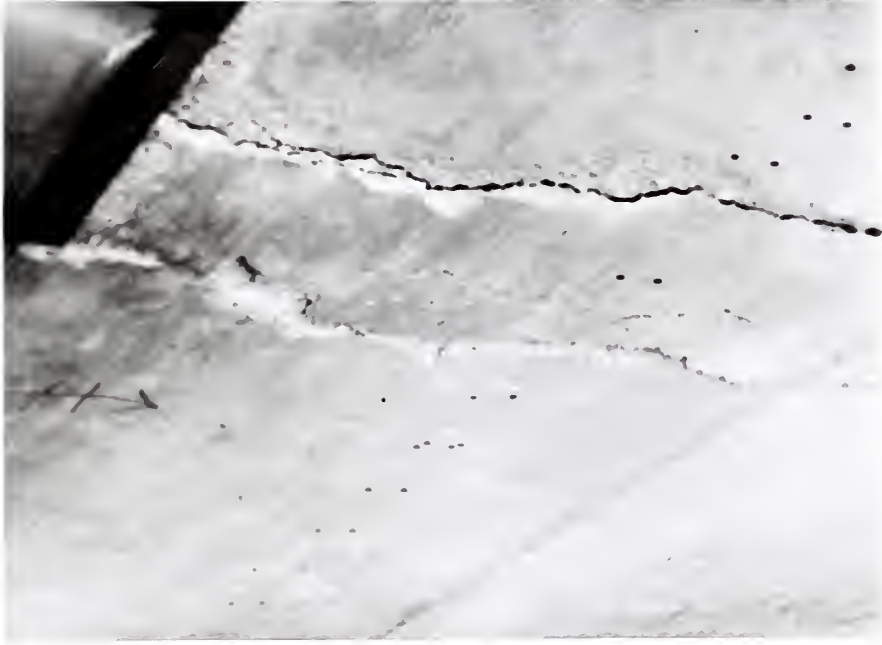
Cracks in a concrete ceiling of the District of Columbia Stadium. The cracks follow the path of the embedded aluminum conduit to the electrical fixture in upper left corner.
